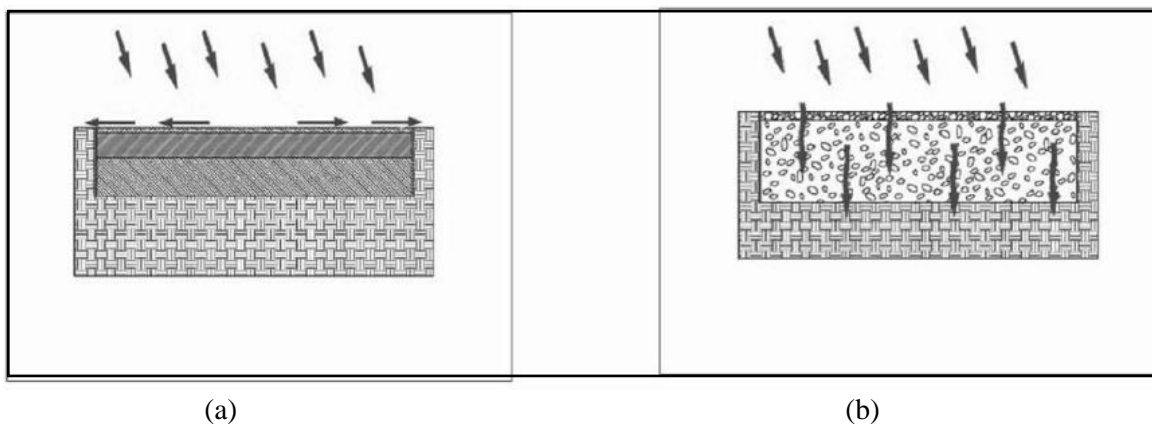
a) Precipitation on Traditional Bitumen Pavement b) precipitation on Porous Pavement
